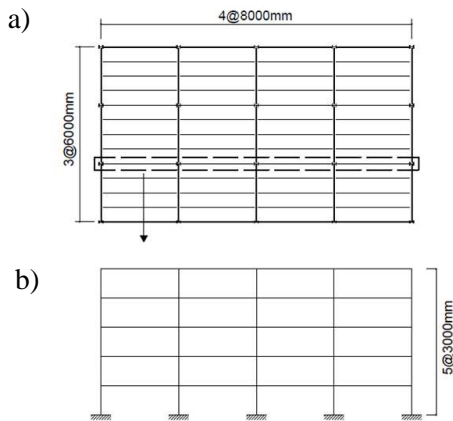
(a) Plan view of prototype building; (b) elevation of interior MRF
